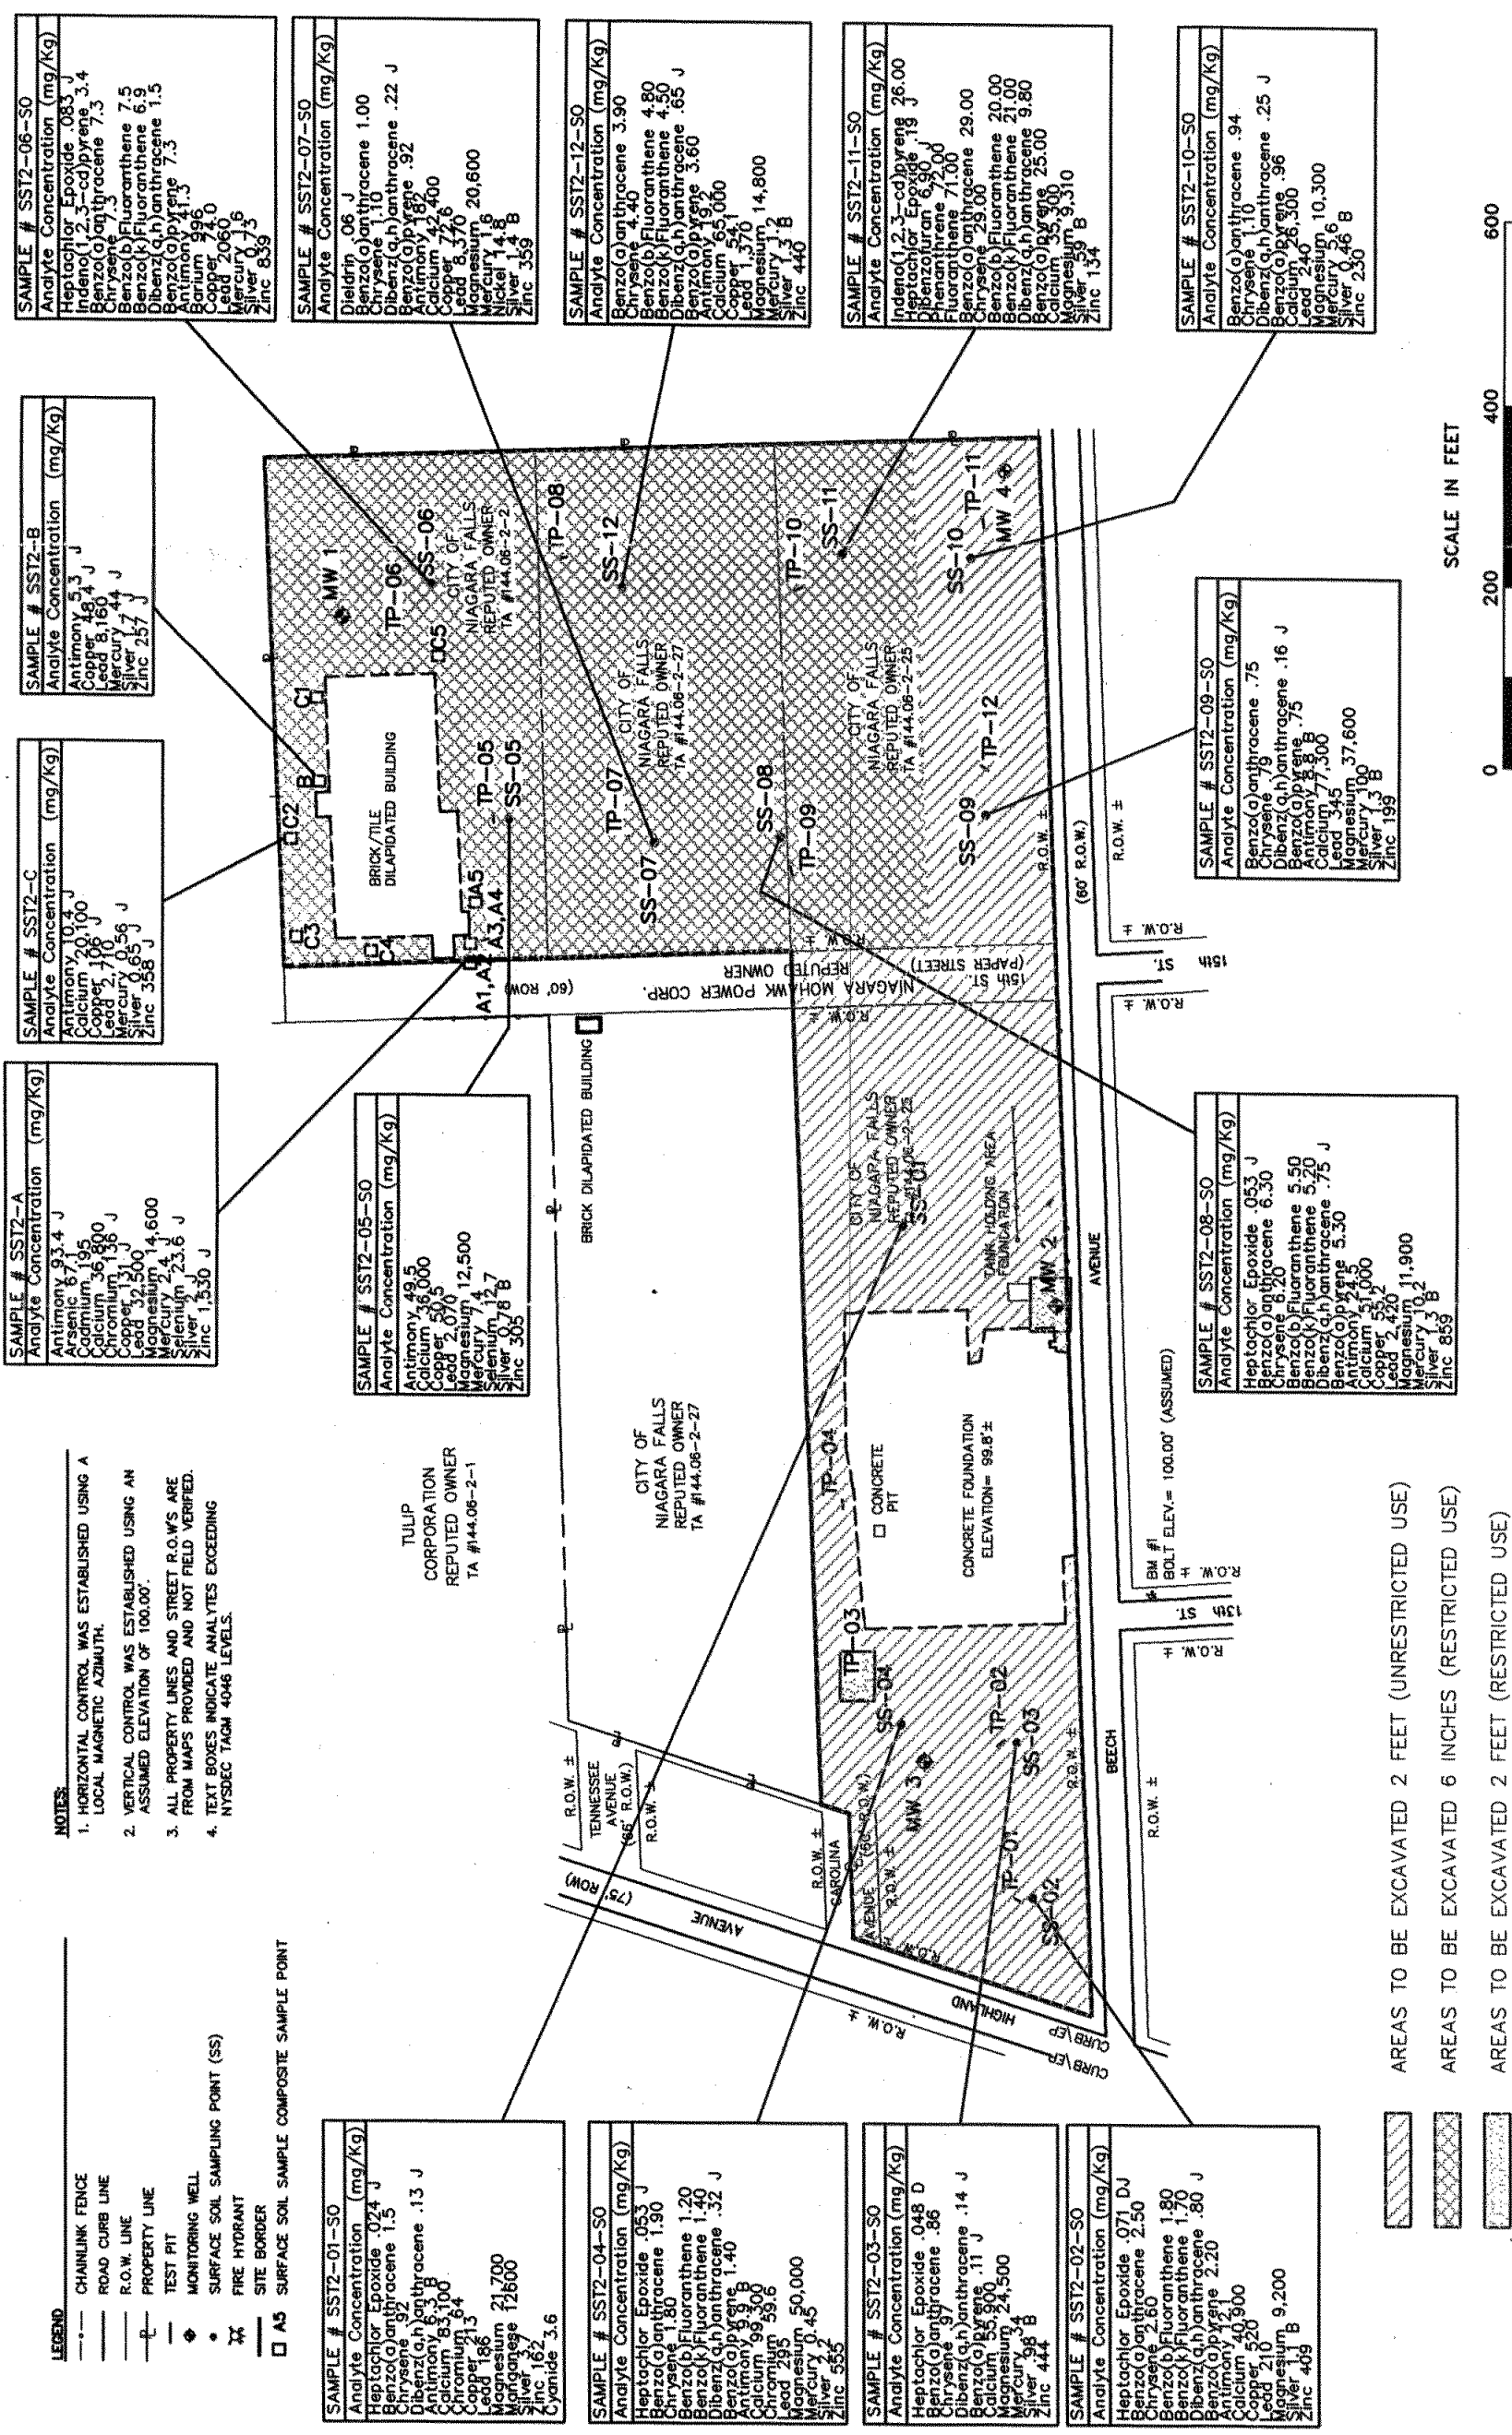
ALTERNATIVE 2 - AREAS TO BE EXCAVATED TRACT II SITE, NIAGARA FALLS, NEW YORK
